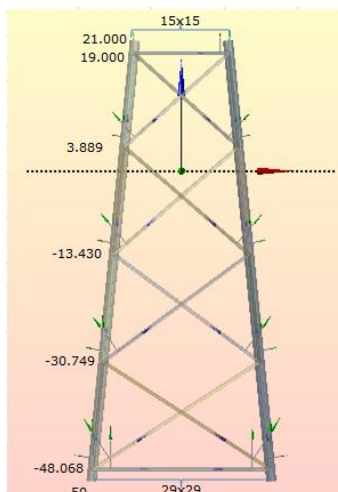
Joints z-level wrt LAT. Mud-line and interface level dimensions in m
